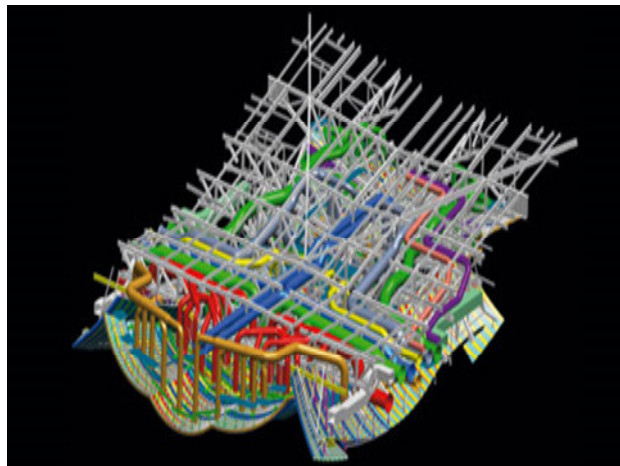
Computer model of a building with detailed plans of a particular subsystem (picture from (The Economist 2008))
